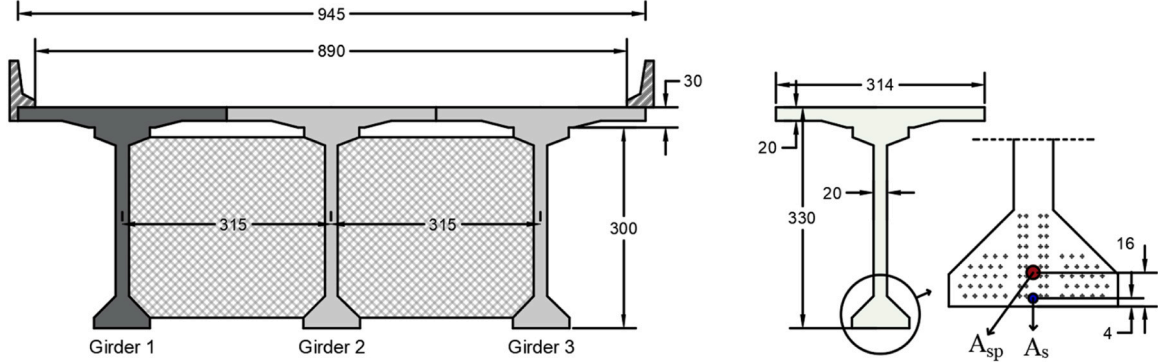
Bridge Deck and Edge Girder Cross Sections at Midspan with equivalent reinforcement position A_{sp} and A_s (dimensions in cm).
